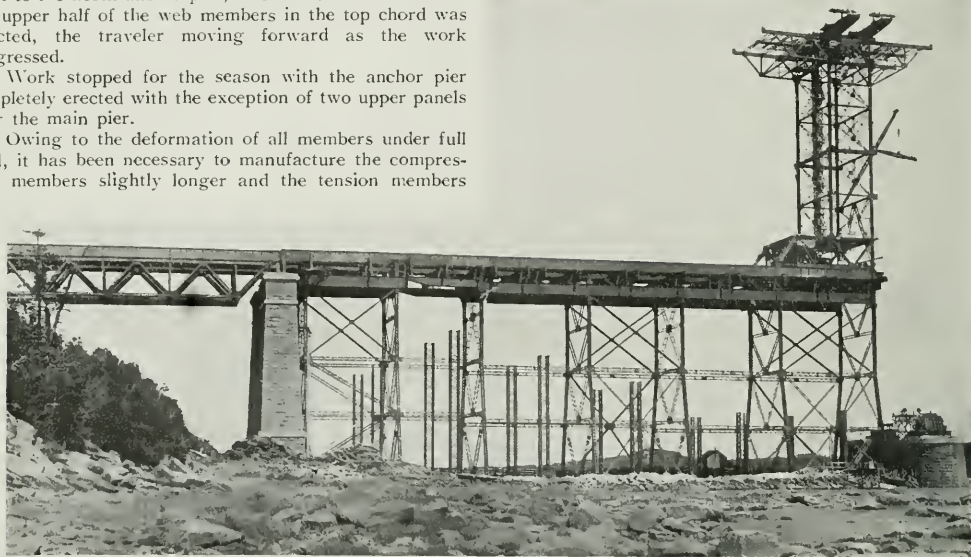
Falsework and Floor Erected, and a Start Being Made on the Erection of the Main Shoes.
